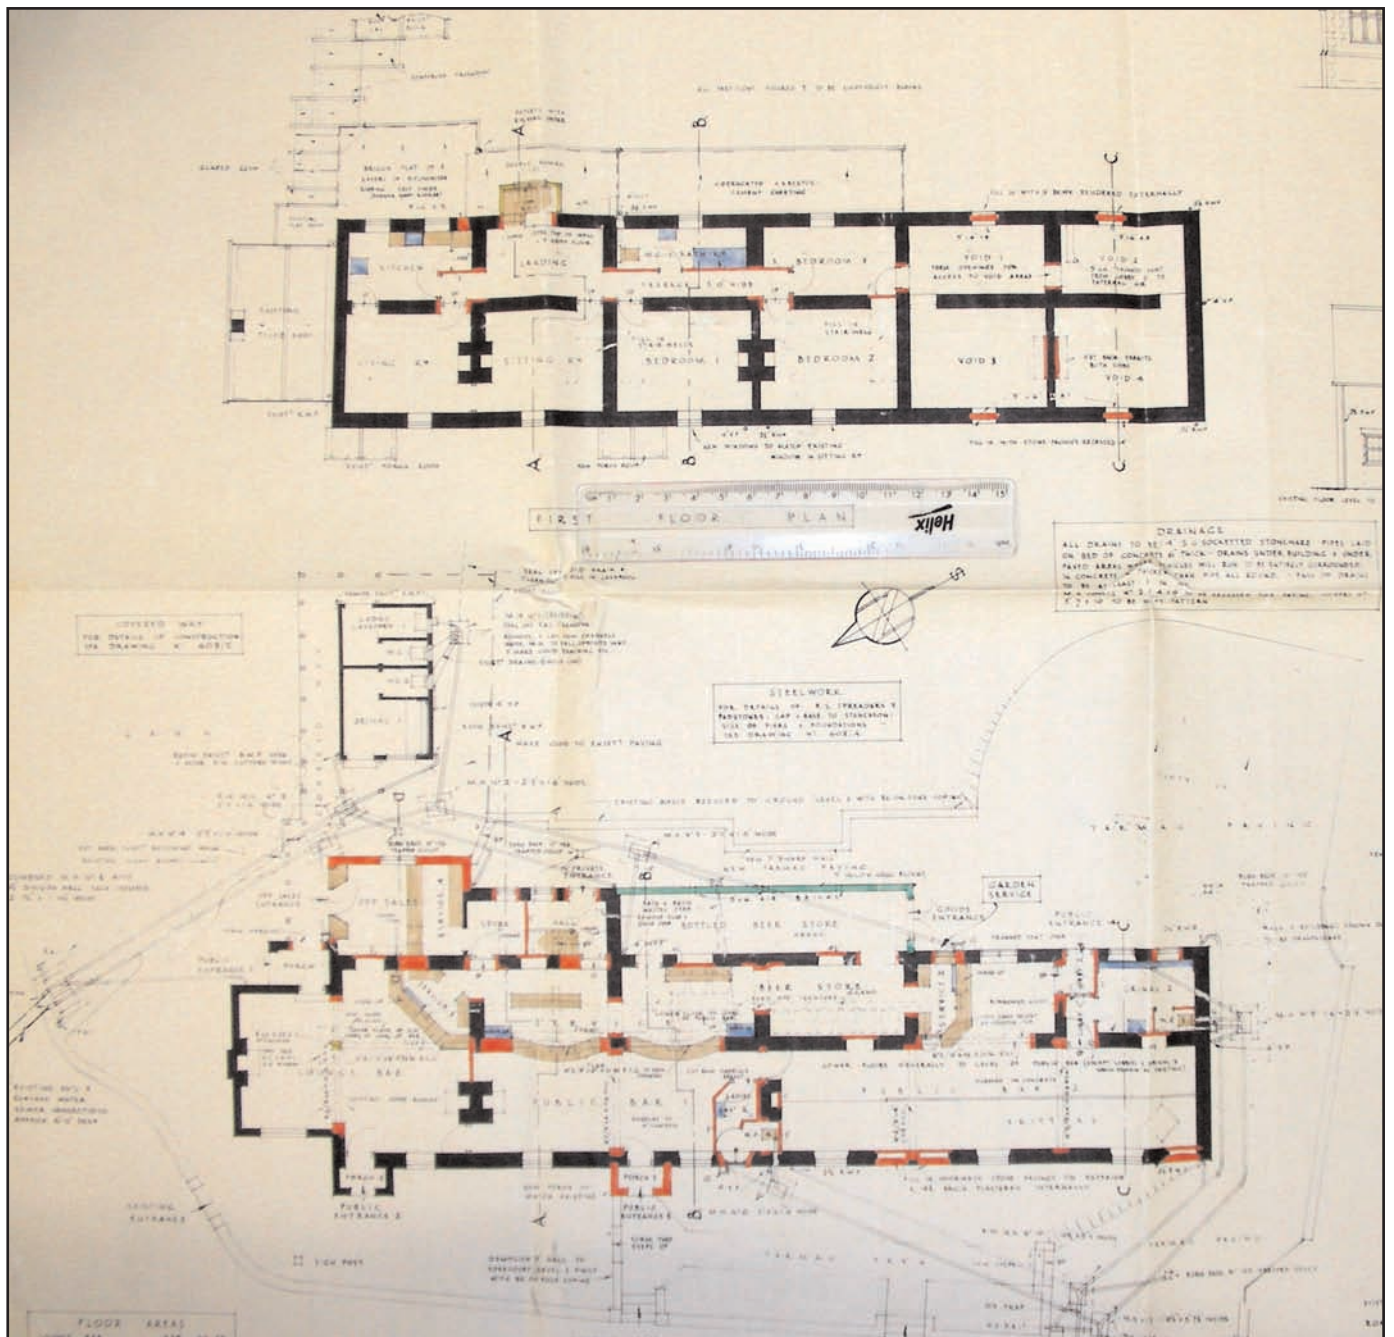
Extract from architectural drawing (ground- & first-floor plans) for proposed alterations (not undertaken) to the Masons Arms and four houses on the study area, dated 1952 (BCC)
